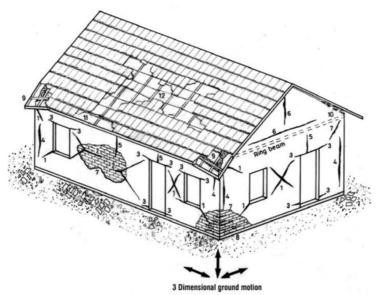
Typical damages in a masonry building (Earthquakes and structures, 2021).
